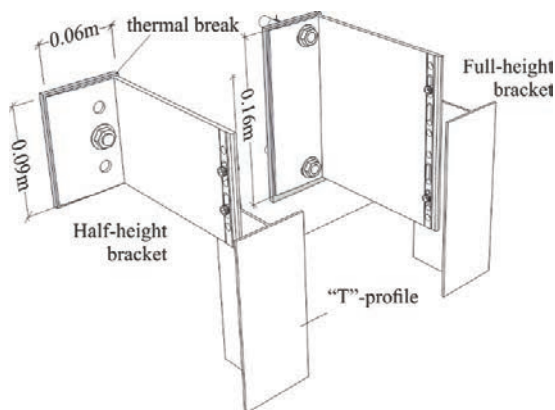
Sketch of the brackets used in E2VENT system. Half-height bracket is used in positions between floors and full height brackets in positions at floor level
